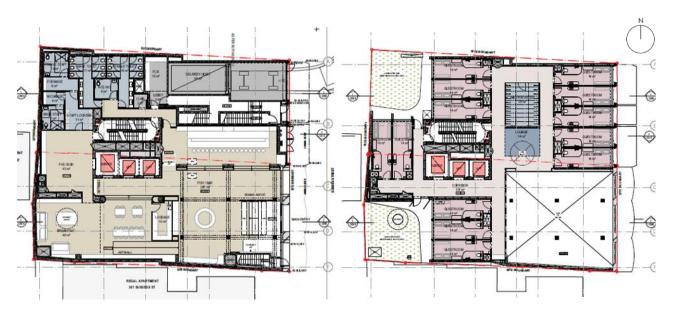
Original Scheme (11 May 2022), Proposed Ground Floor Plan (left) and First Floor Plan (right)
